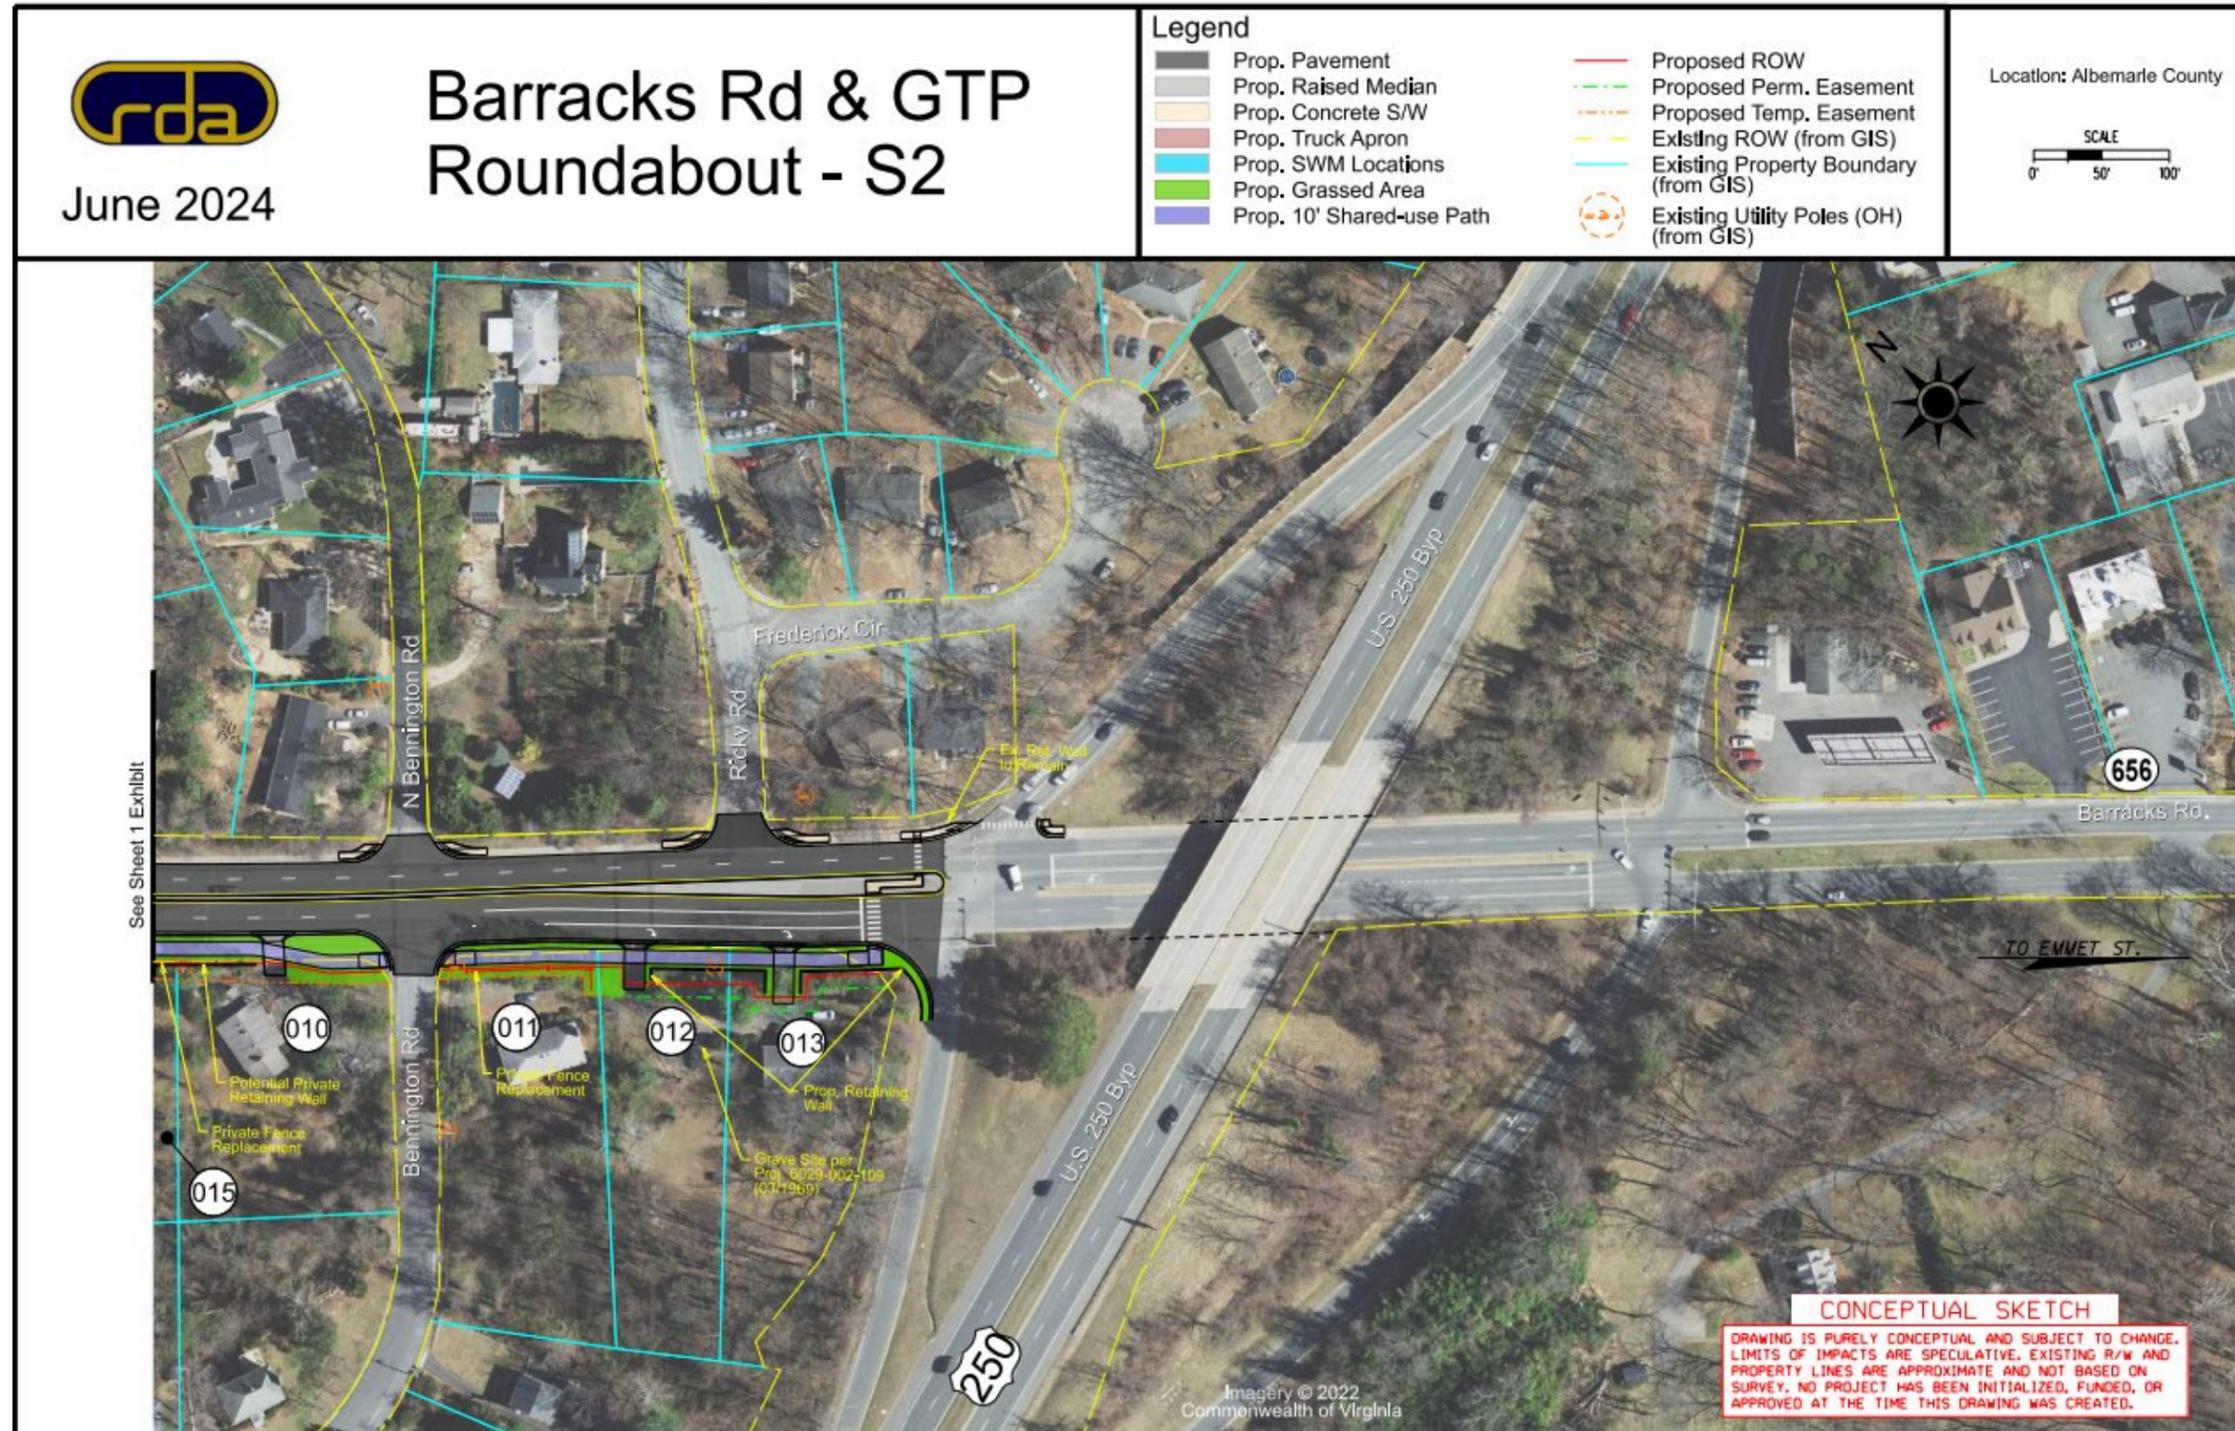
Barracks Road (Route 654) – Layout for Concept 5
